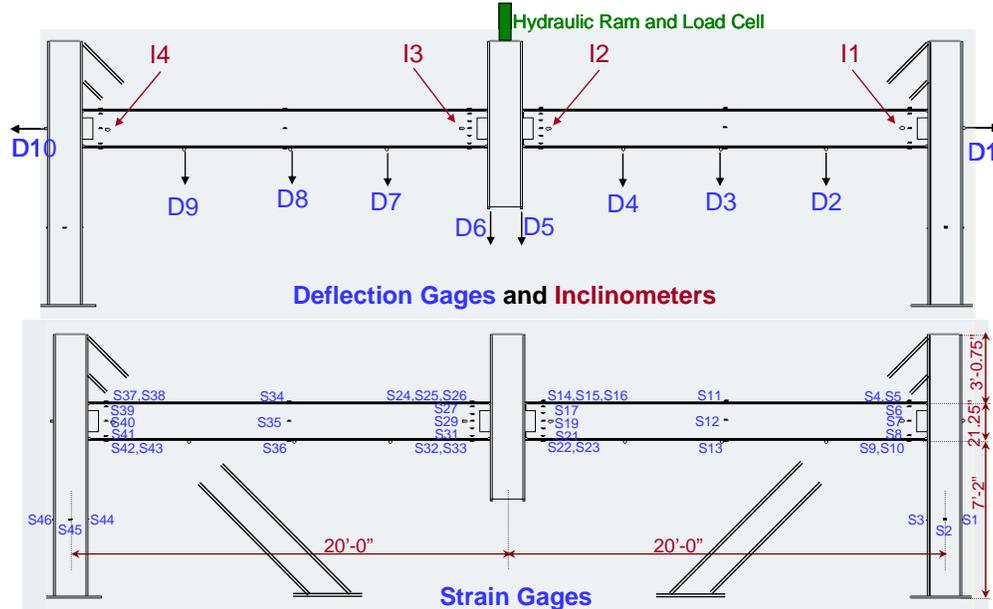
WUF-B Test Specimen Schematic and Instrumentation Layout
